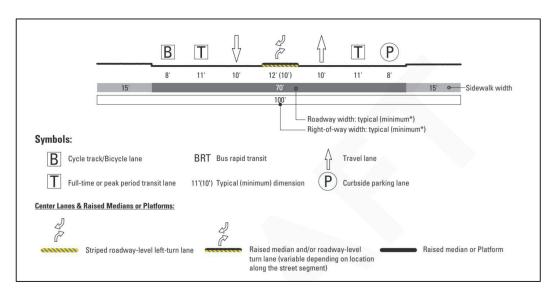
Legend for complete street cross sections (Source: LADCP, 2014)
